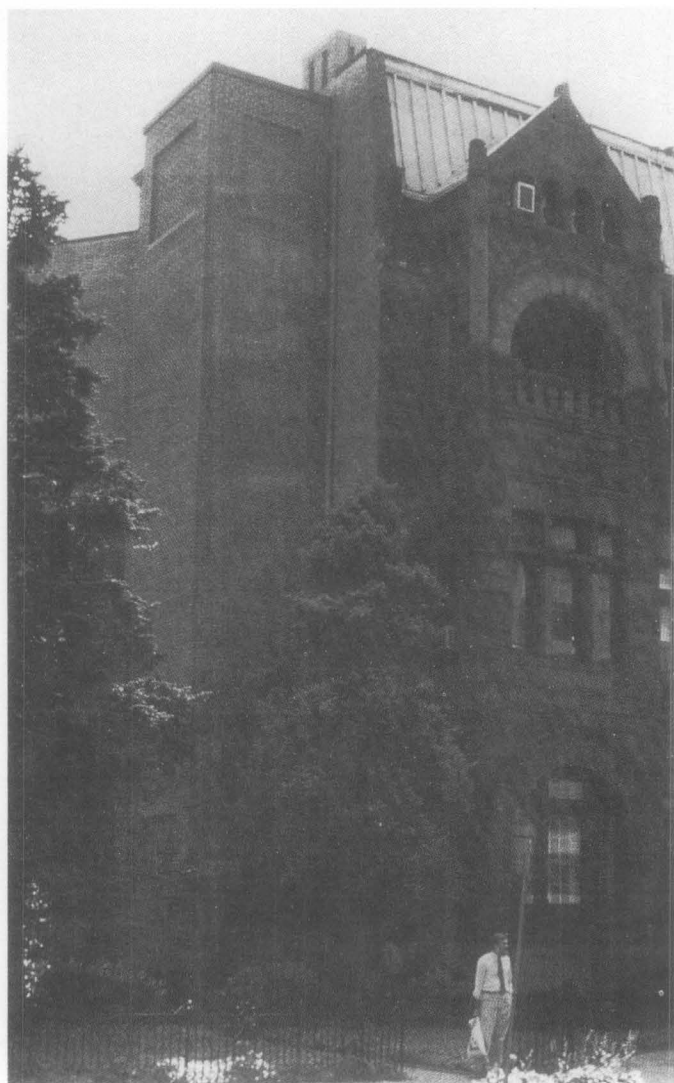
Creating an accessible entrance with a new elevator tower requires a compatible design. This elevator addition blends in with the historic building’s materials and provides access to all public levels. Photo: Sharon Park.
